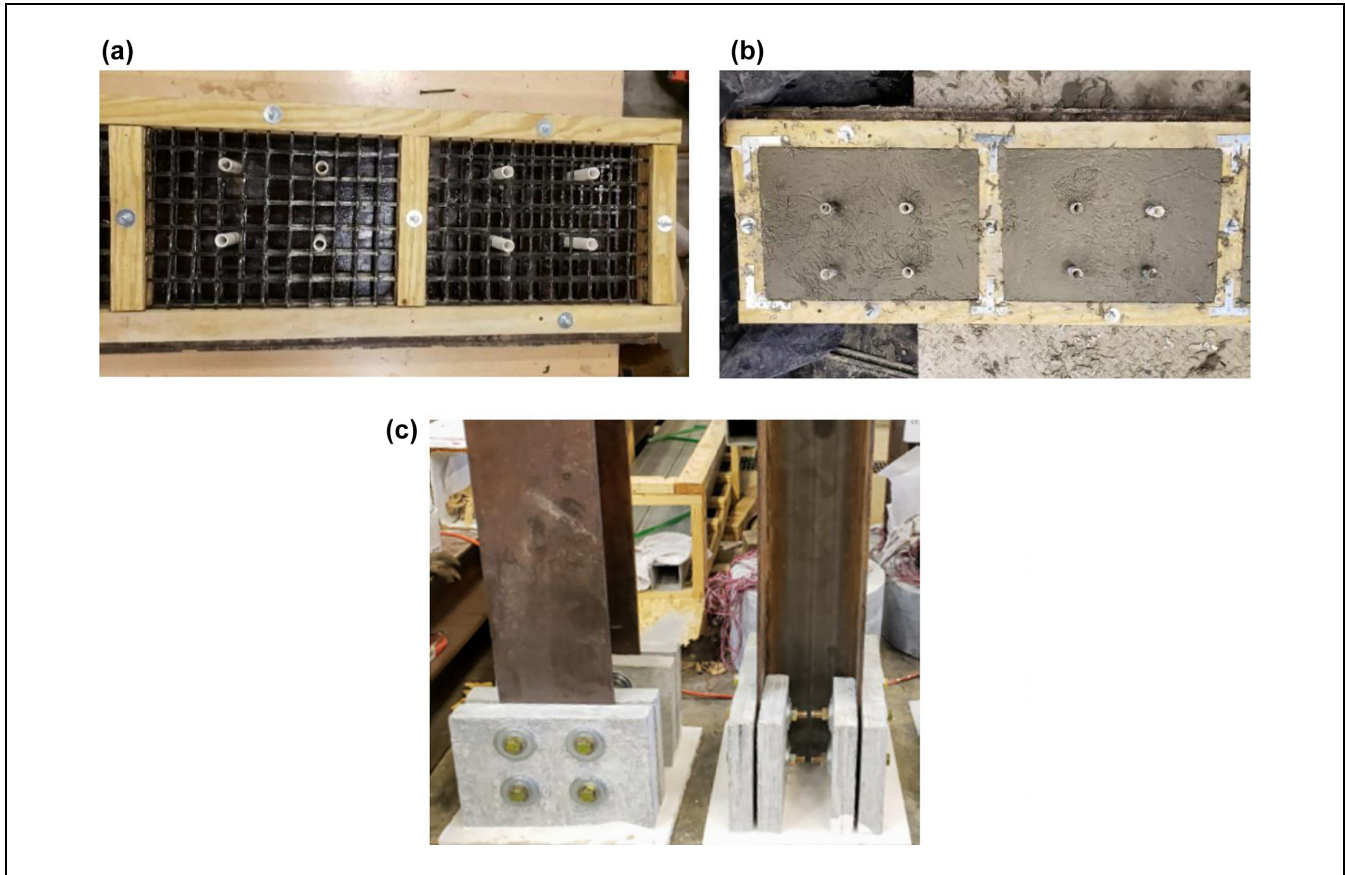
UHPC plates: (a) formwork with CFRP grids; (b) casting; and (c) bolted to a steel H-pile.
